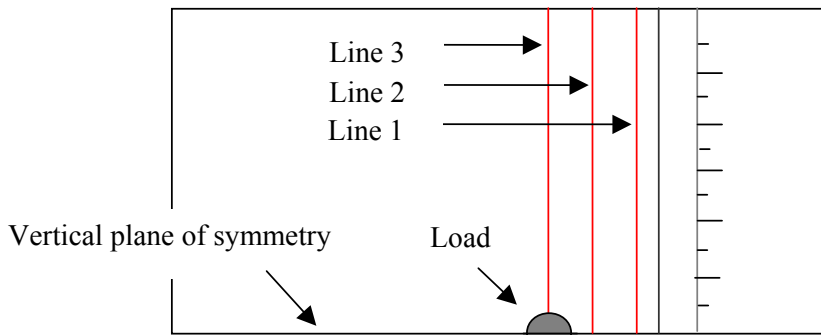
Symmetry plane of the 3D model including the pavement edge
